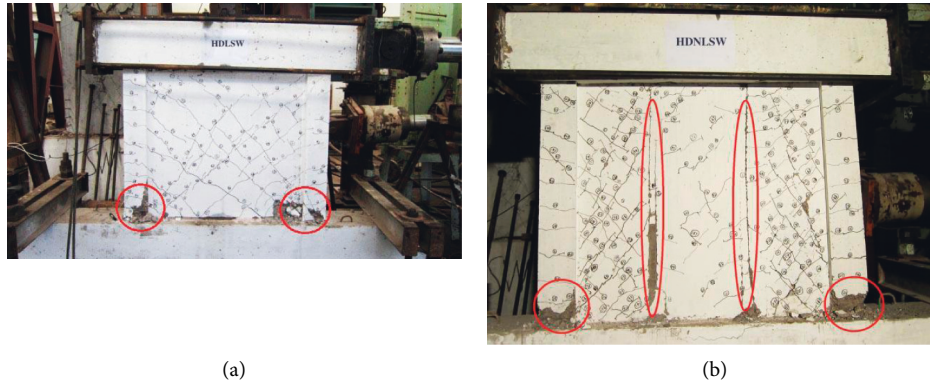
Crack development of the two specimens: (a) specimen HDLSW; (b) specimen HDNLSW.
